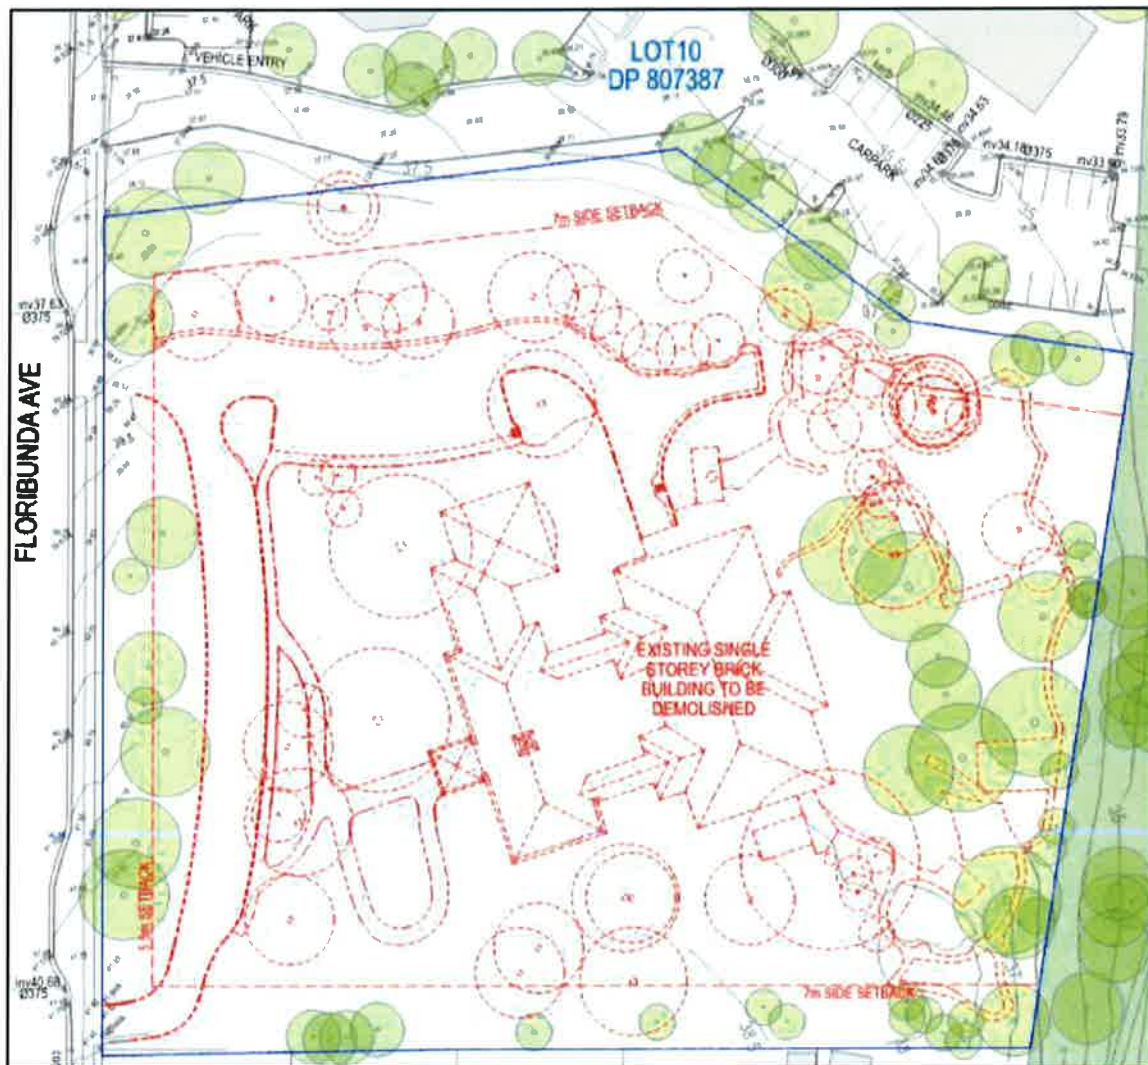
Demolition Plan for the Subject Site (Source: Calderflower Architecture, 2019)
